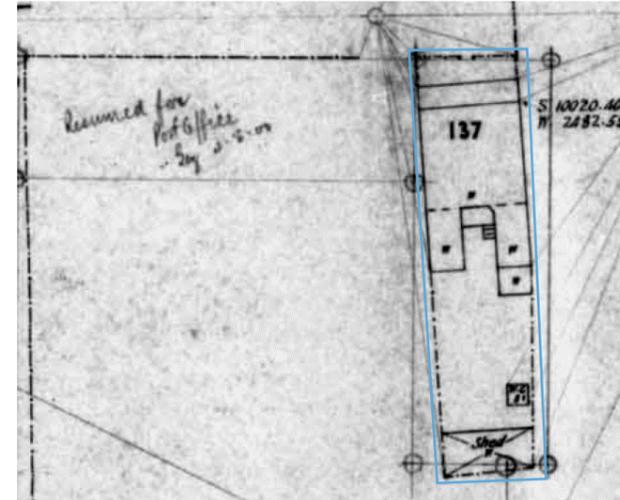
Detail from 1886 plan of northern block (William Henry St to Macarthur St) of current Powerhouse Museum site, depicting the house at 137 William Henry Street. (Source: Sydney Water PWDS 1544-S206)
